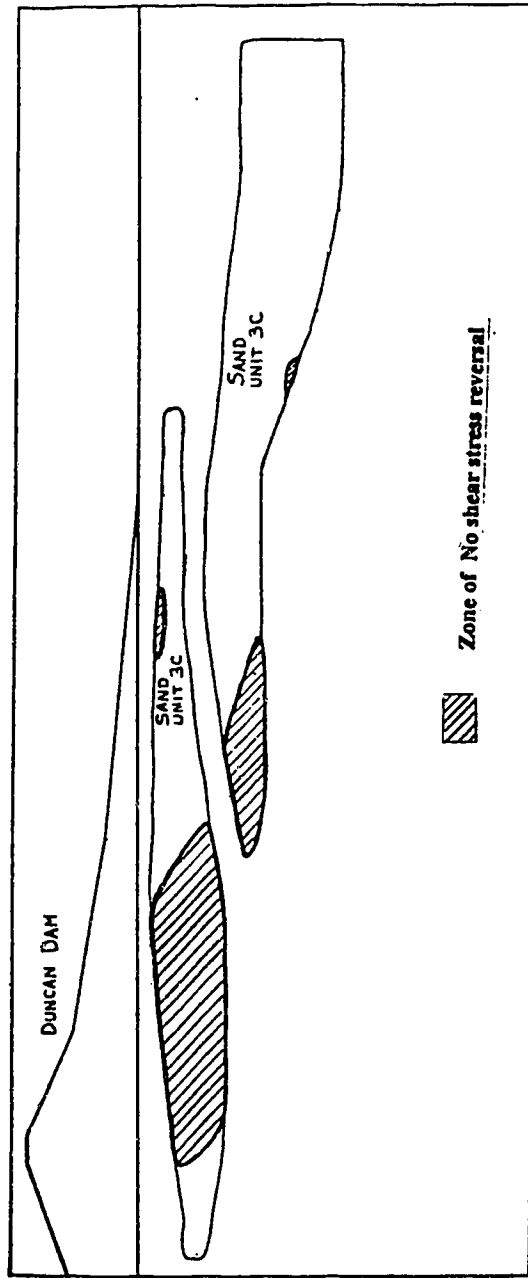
\$ Typical cross section and foundation of Duncan Dam (adapted from Pillai and Stewart, 1993)
